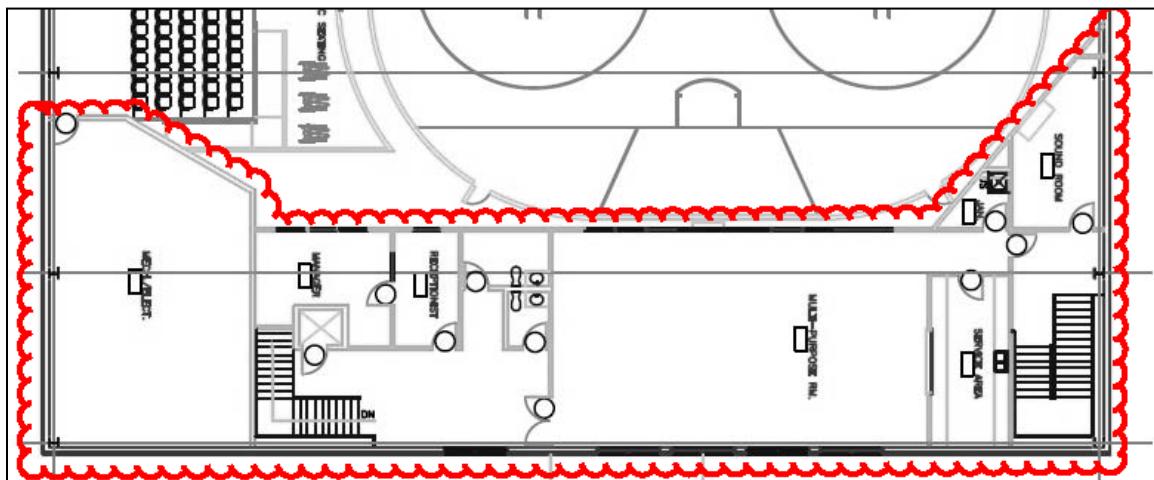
Layout of Second Floor (Removed from Work Scope)
